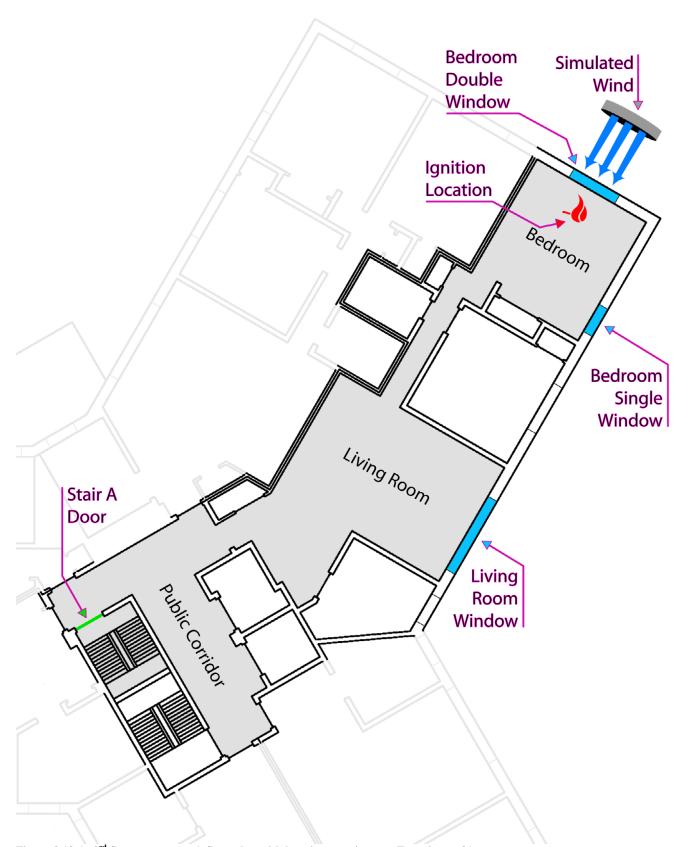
3<sup>rd</sup> floor apartment A floor plan with locations pertinent to Experiment 3A
